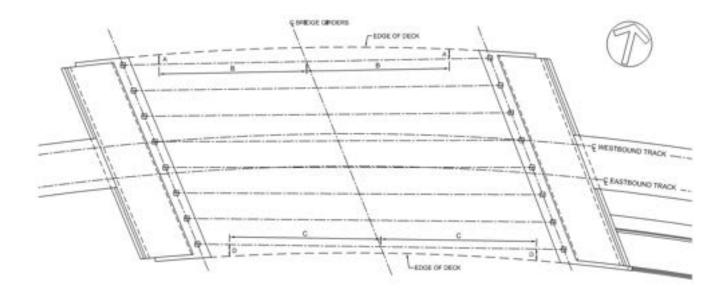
Stony Plain Road Bridge Symmetric Overhang from Exterior Girders
